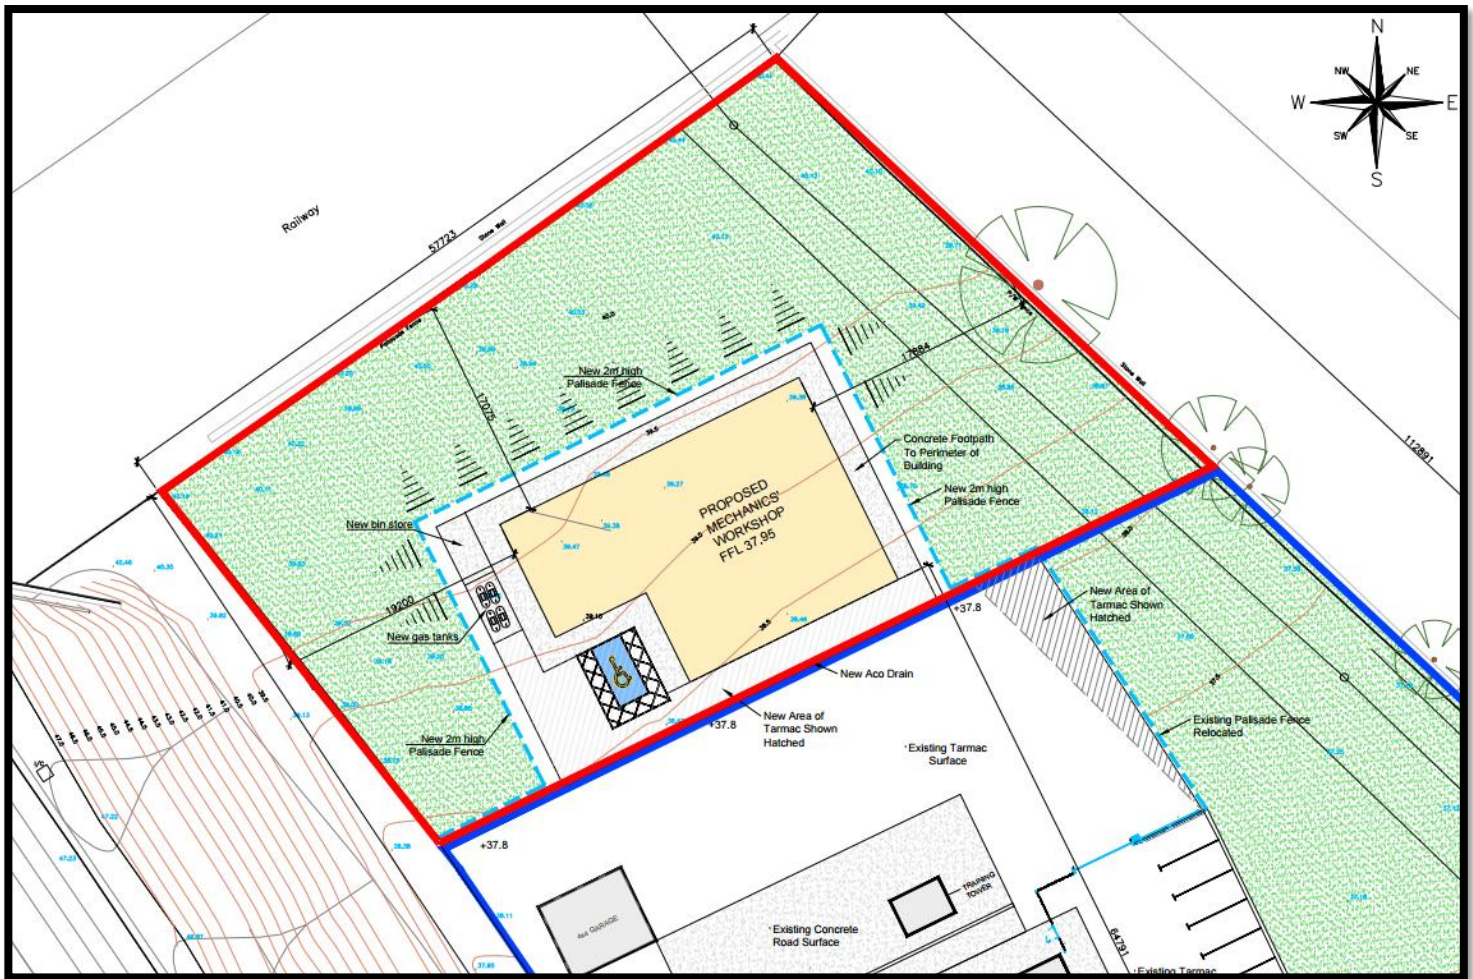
Extract of Site layout prepared by Vincent Hannon Architects
